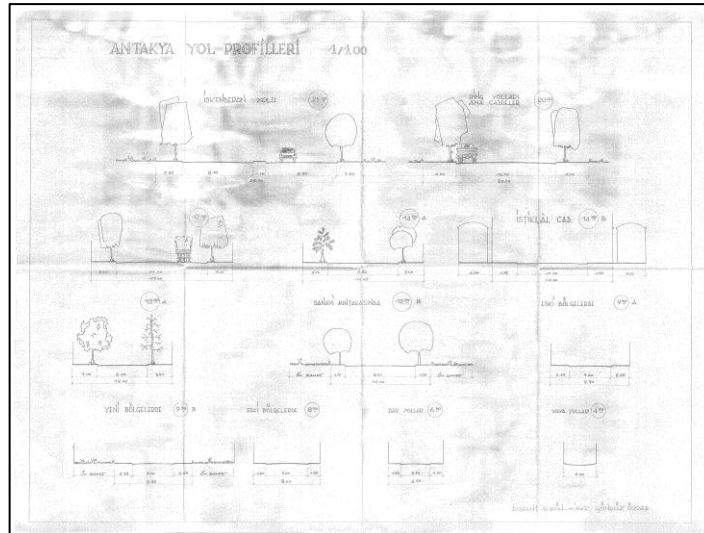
Proposed street sections in the development plan (Source: Antakya Municipality)
